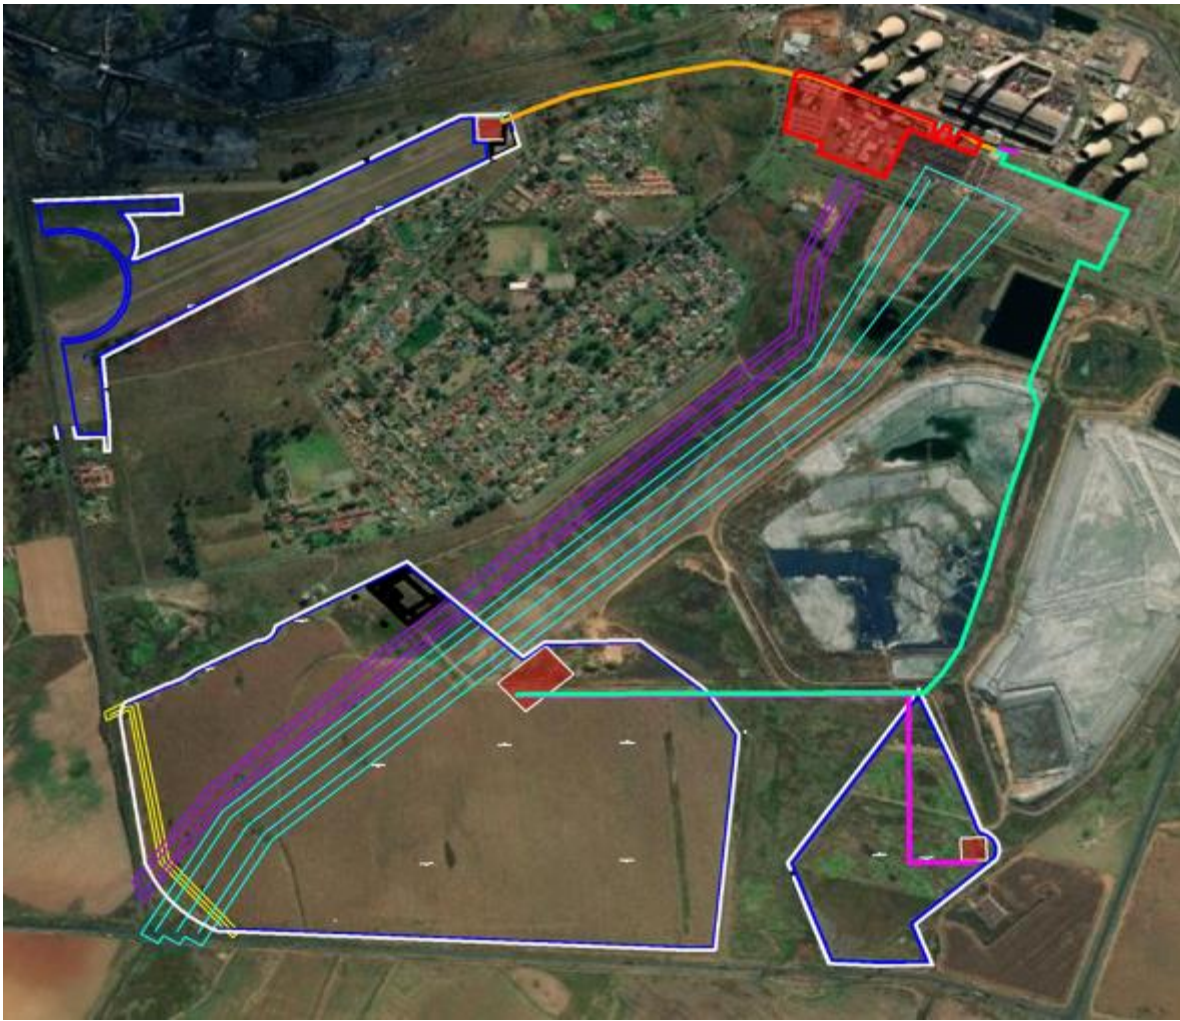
Proposed Amended Infrastructure Layout (courtesy WSP).
